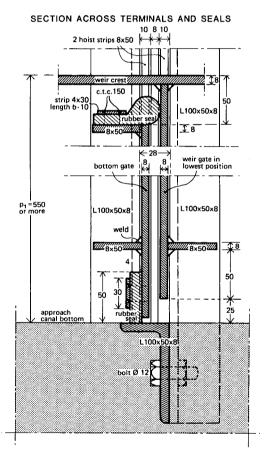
Sections showing groove arrangements, terminals and seals for movable weir with bottom gate (dimensions in mm).
